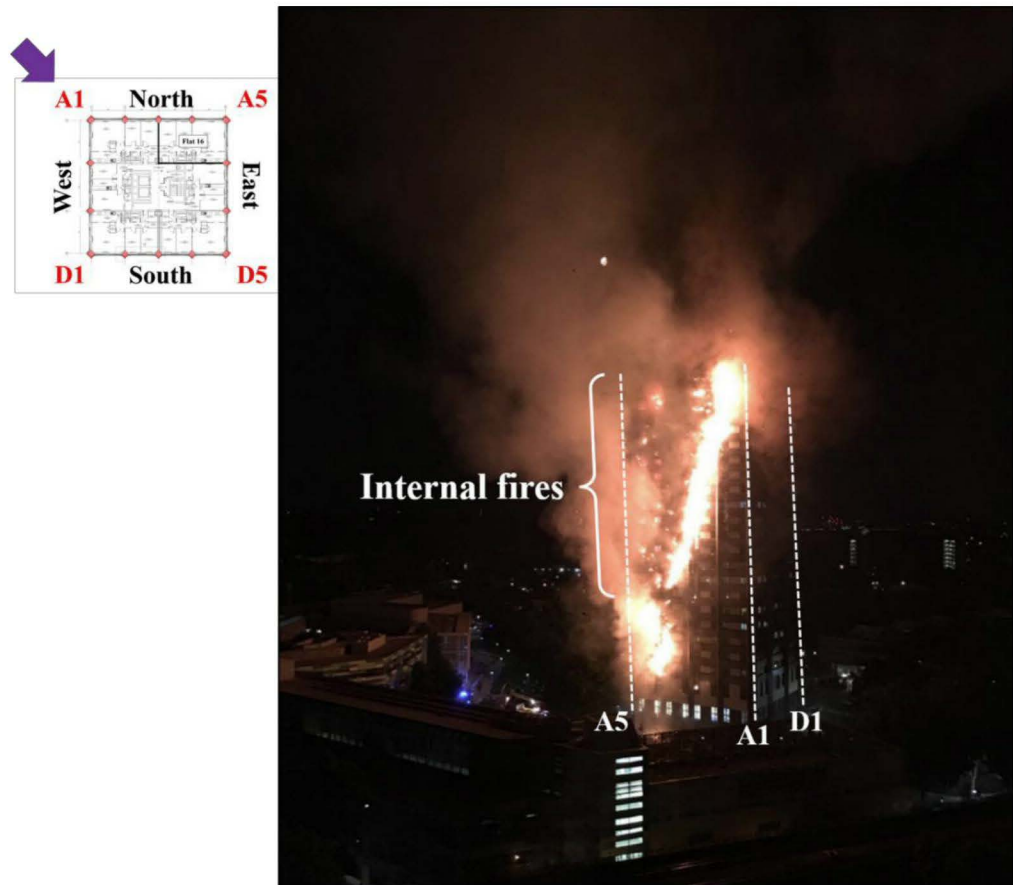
Diagonal flame front along External Flame Spread Route 1, that is, on the North elevation of the building envelope at 02:34 on 14 June 2017 (MET00012593) (SEA00010474)
